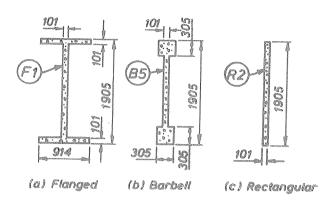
Nominal Cross Sectional Dimensions of the PCA Test Specimens (11).
